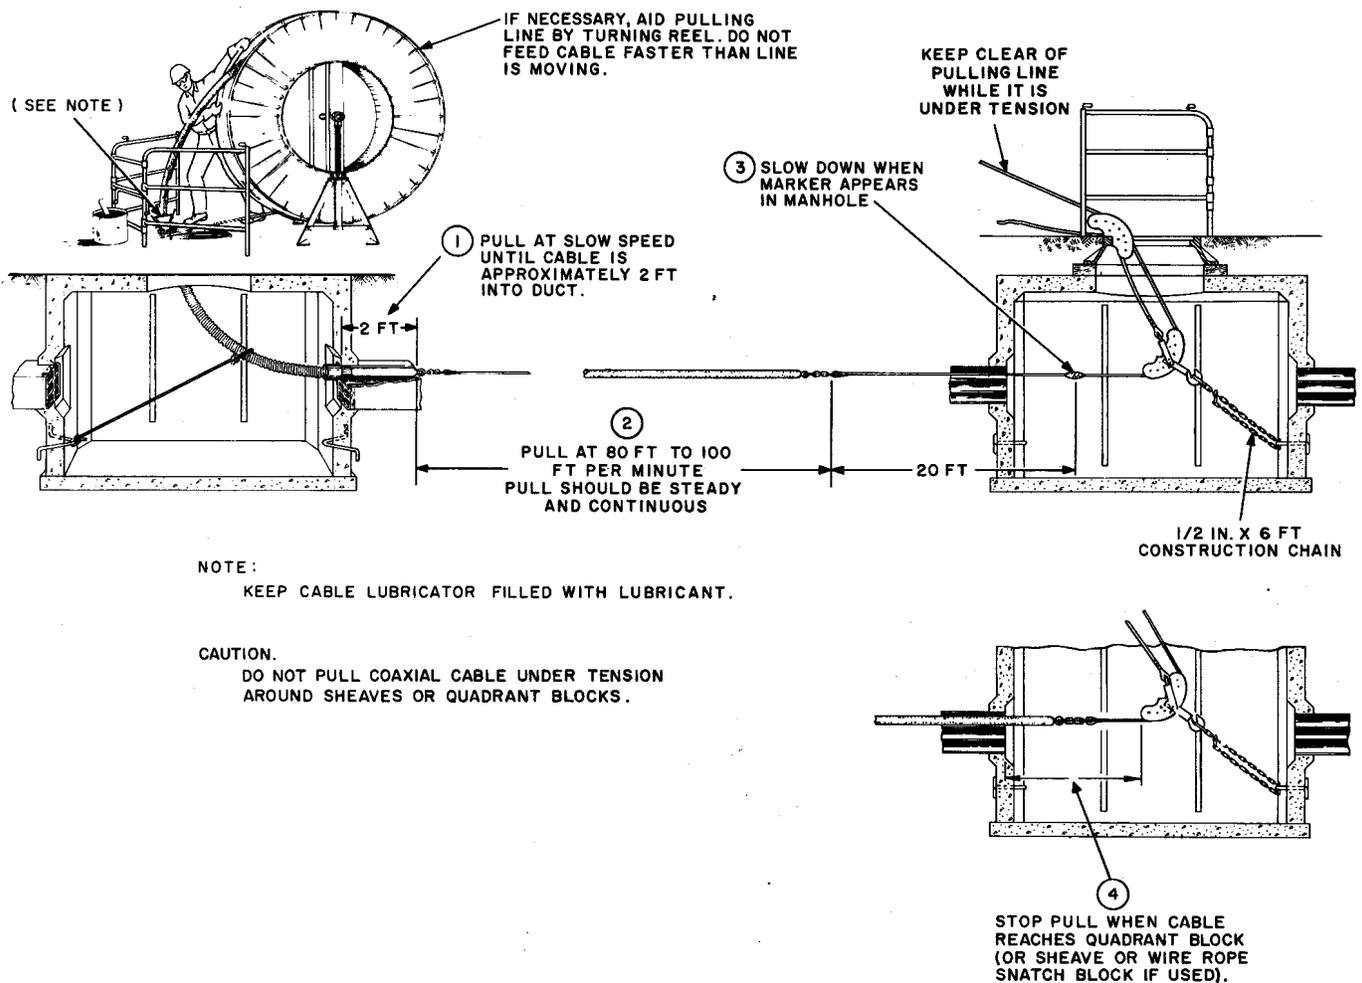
Typical Setup for Placing Coaxial Cable in Underground Conduit
